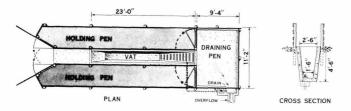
Dipping vat. (Plan Exchange No. 5390.)
